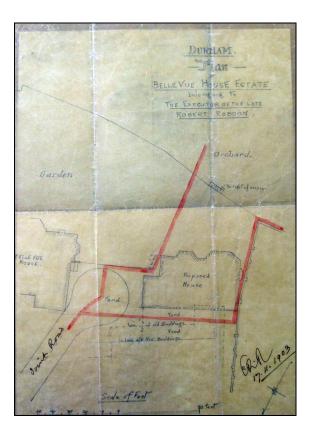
Plan of Belle View Estate, showing proposed outline for new house, c. 1903
